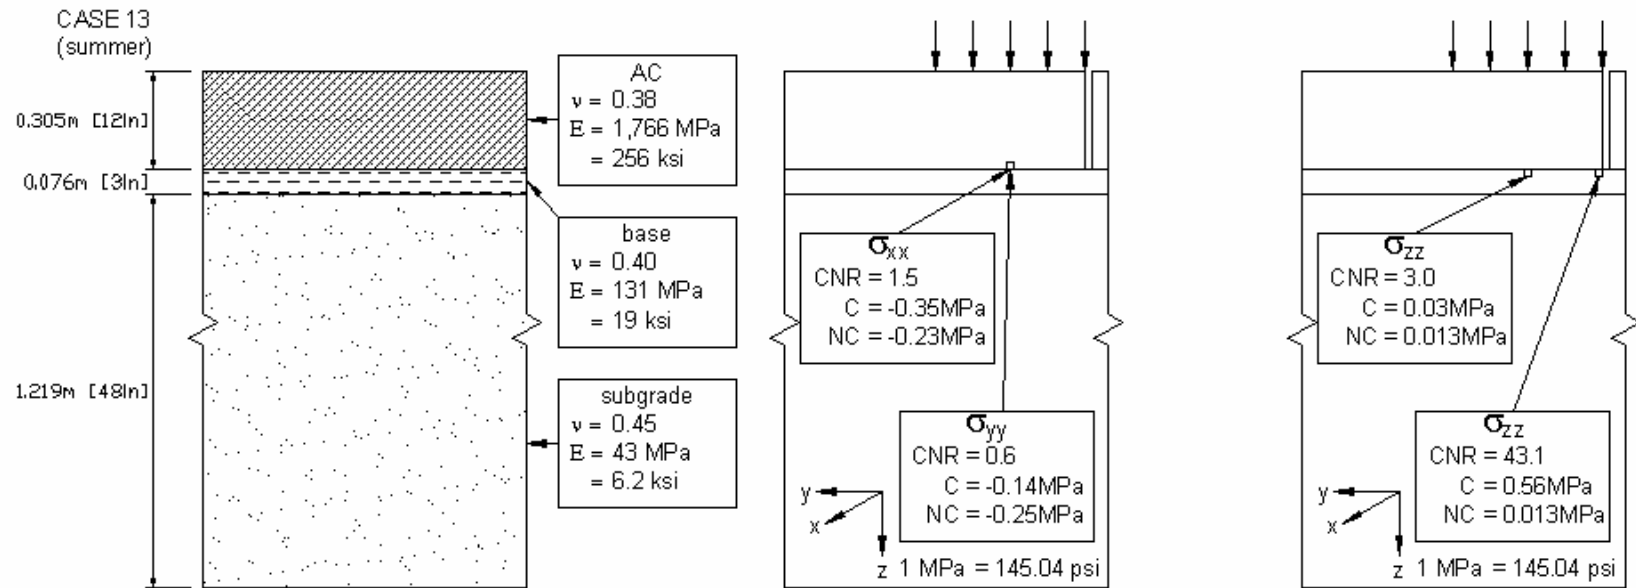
Summary cross section for case 13, AC = 0.3 m, base = 0.076 m, and sand subgrade = 1.22 m (C – stress in cracked pavement, NC – stress in pavement with no crack, CNR – crack/no crack (stress) ratio)
